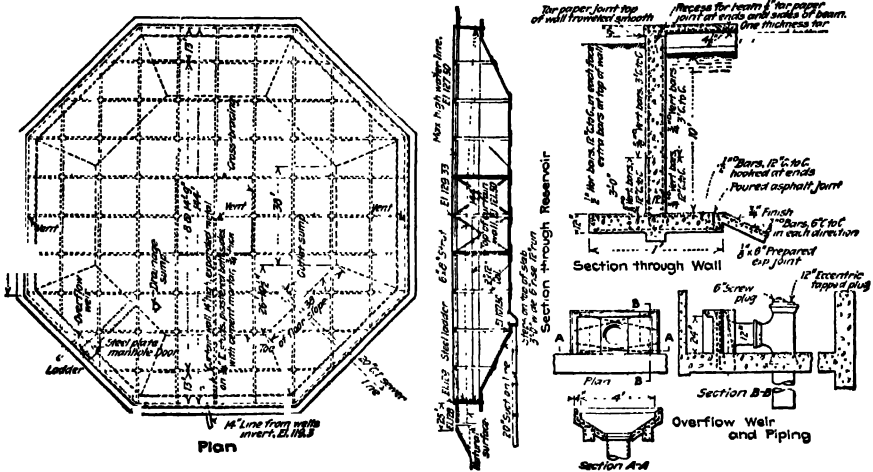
Octagonal concrete reservoir at Enid, Oklahoma.
